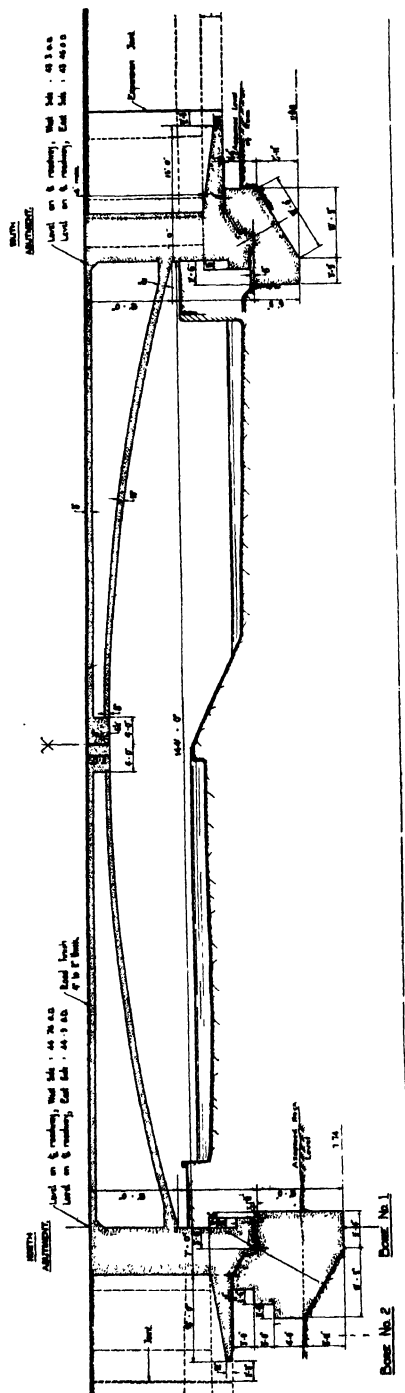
NEW BRIDGE AT BRIDGE OF ALLAN: LONGITUDINAL SECTION ON CENTRE LINE.
